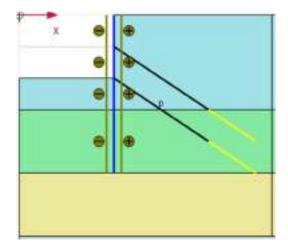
Phase 4, activation of the second anchor and geotextile (grouting). Pre-stressing of the anchor to a value of 300 kN/m.
